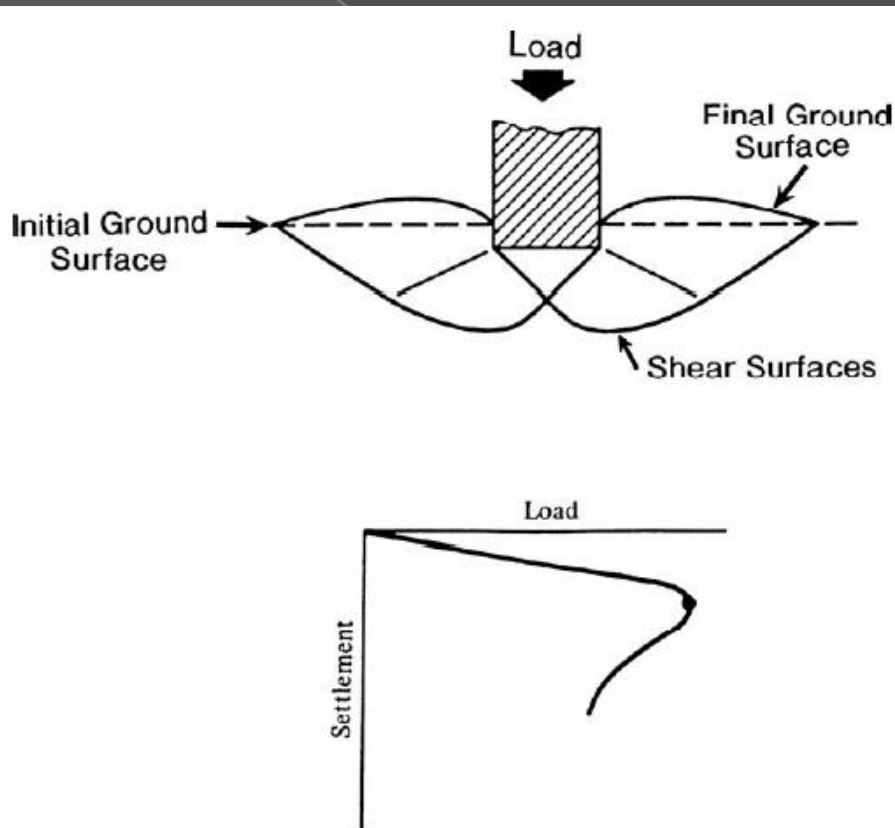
General shear foundation failure. (After Vesic, 1963.)
